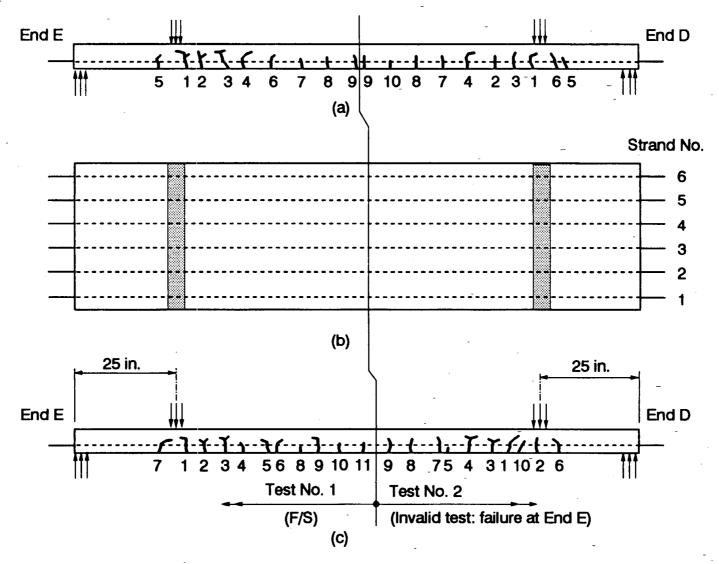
Crack patterns for D-type Specimen No. 9-6.0DC-3:
